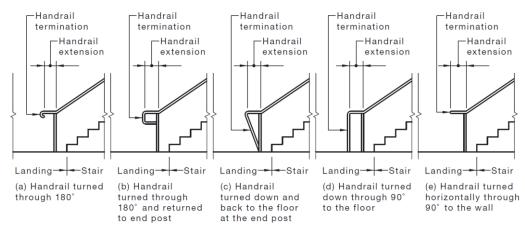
Handrail Details - Section 11.1 and 12 of AS1428.1-2009
